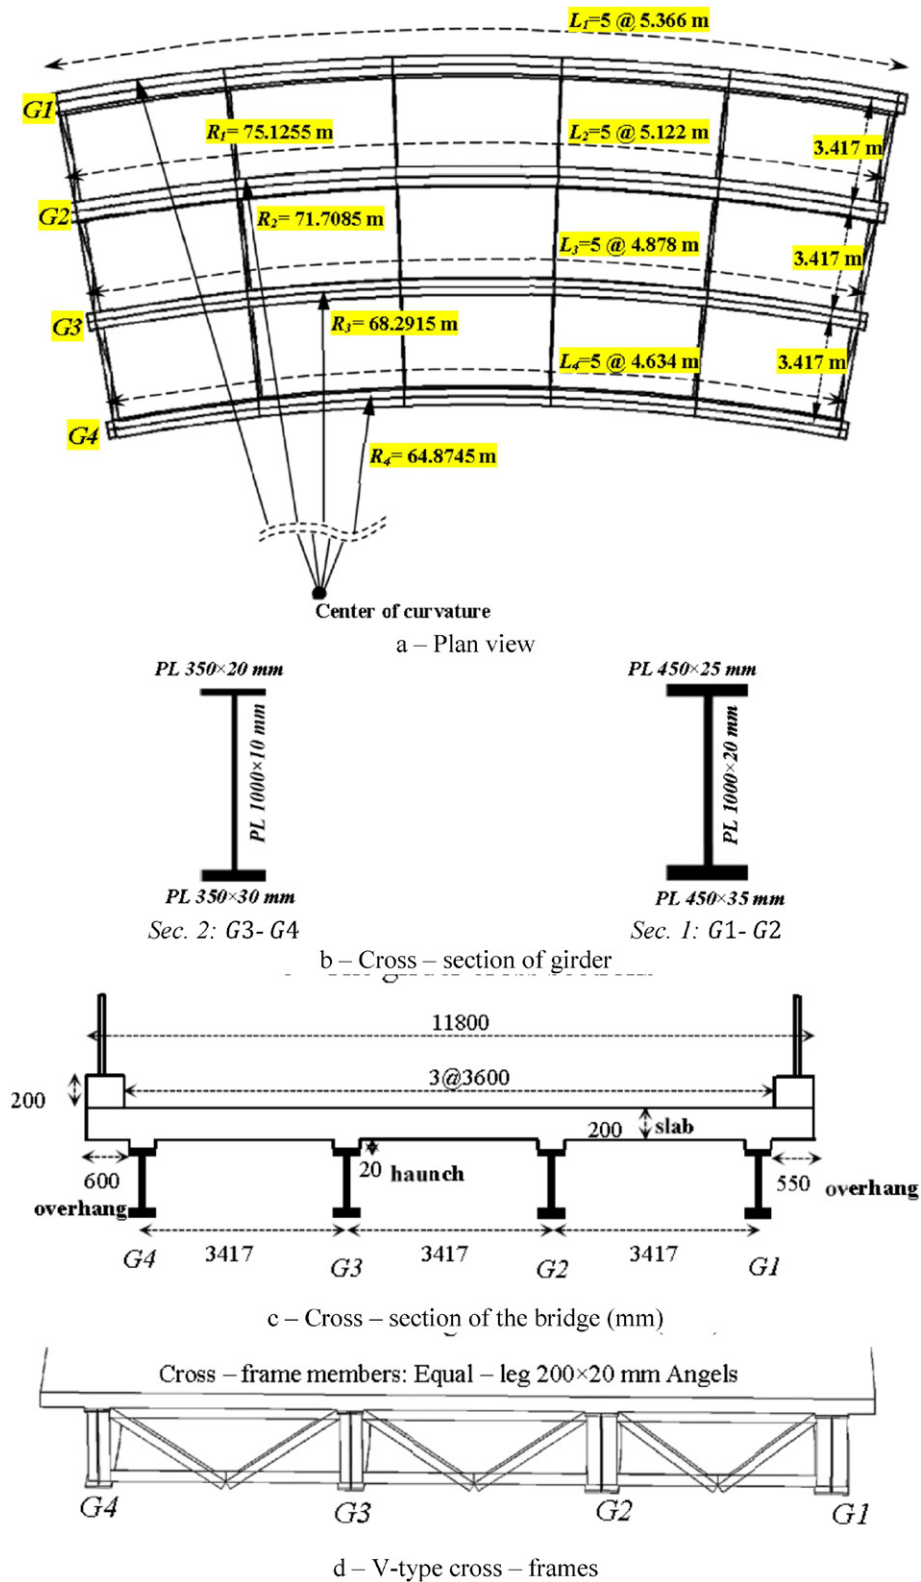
Base bridge model geometry. a – Plan view. b – Cross-section of girder. c – Cross-section of the bridge (mm). d – V-type cross-frames.
